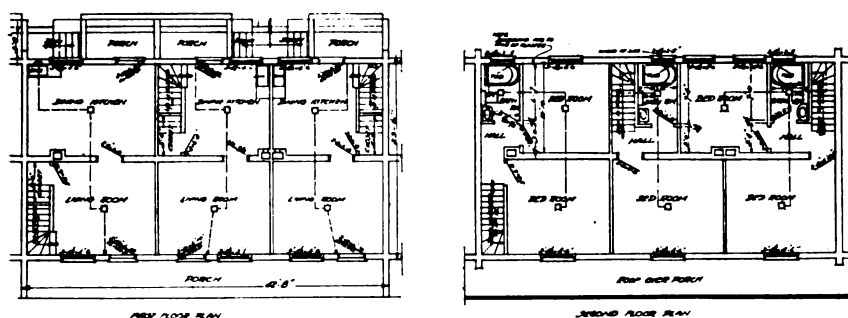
(C) FLOOR PLANS, THREE-FAMILY TERRACE
